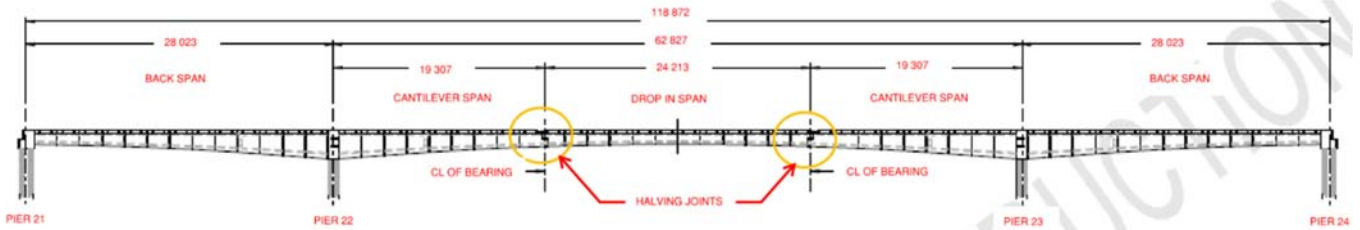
Span arrangement between piers 21-24 including enlarged half-length of bridge section [6]
